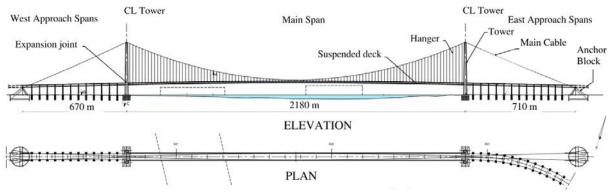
Elevation and Plan of ShiZiYang Main Bridge.
